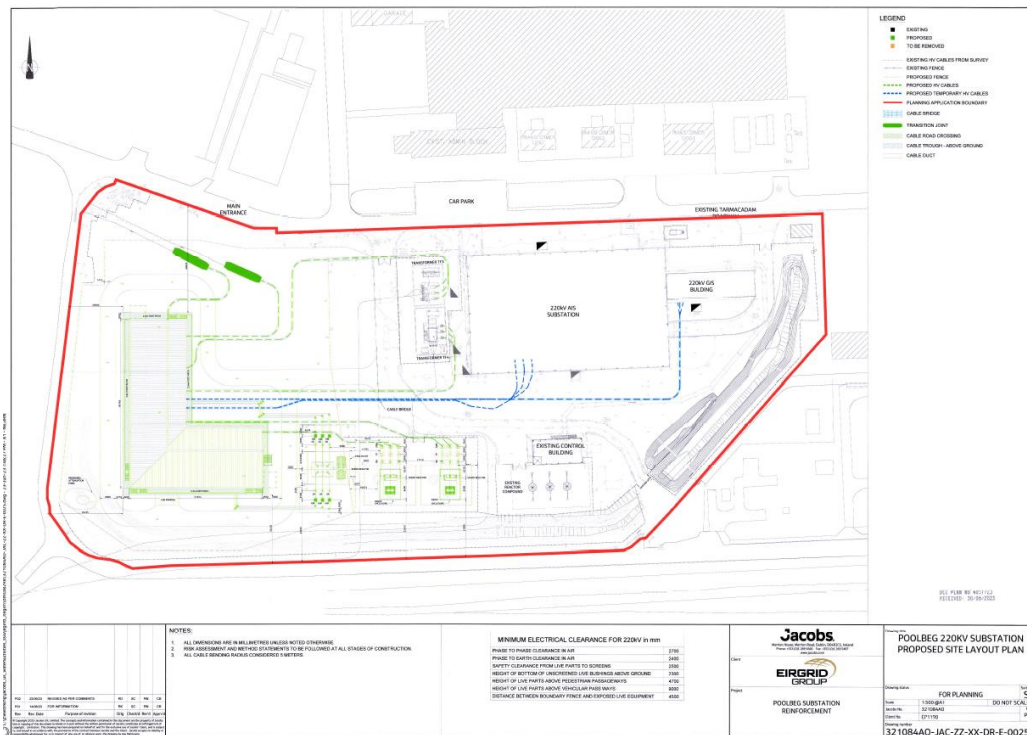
Proposed site layout plan of the Poolbeg 220KV substation (Source: Jacobs / EirGrid as displayed on DCC website)
